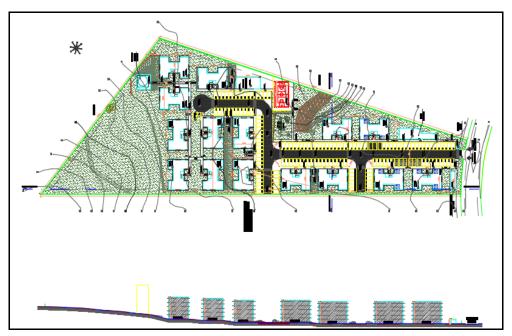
Proj. A (Queimados) Master Plan, cross section.
